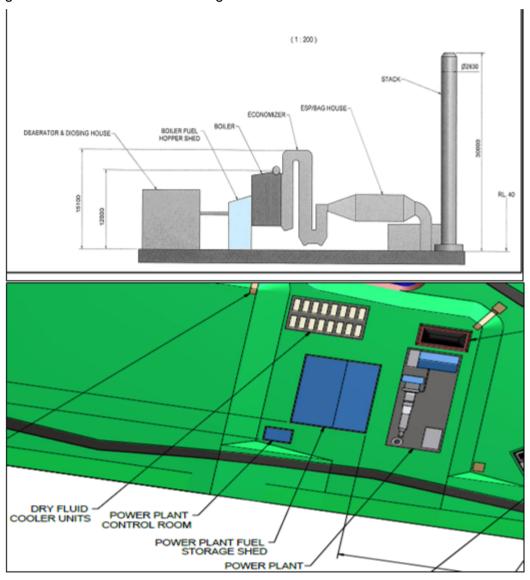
Combined Site Layout/Elevation: Cogeneration Plant
